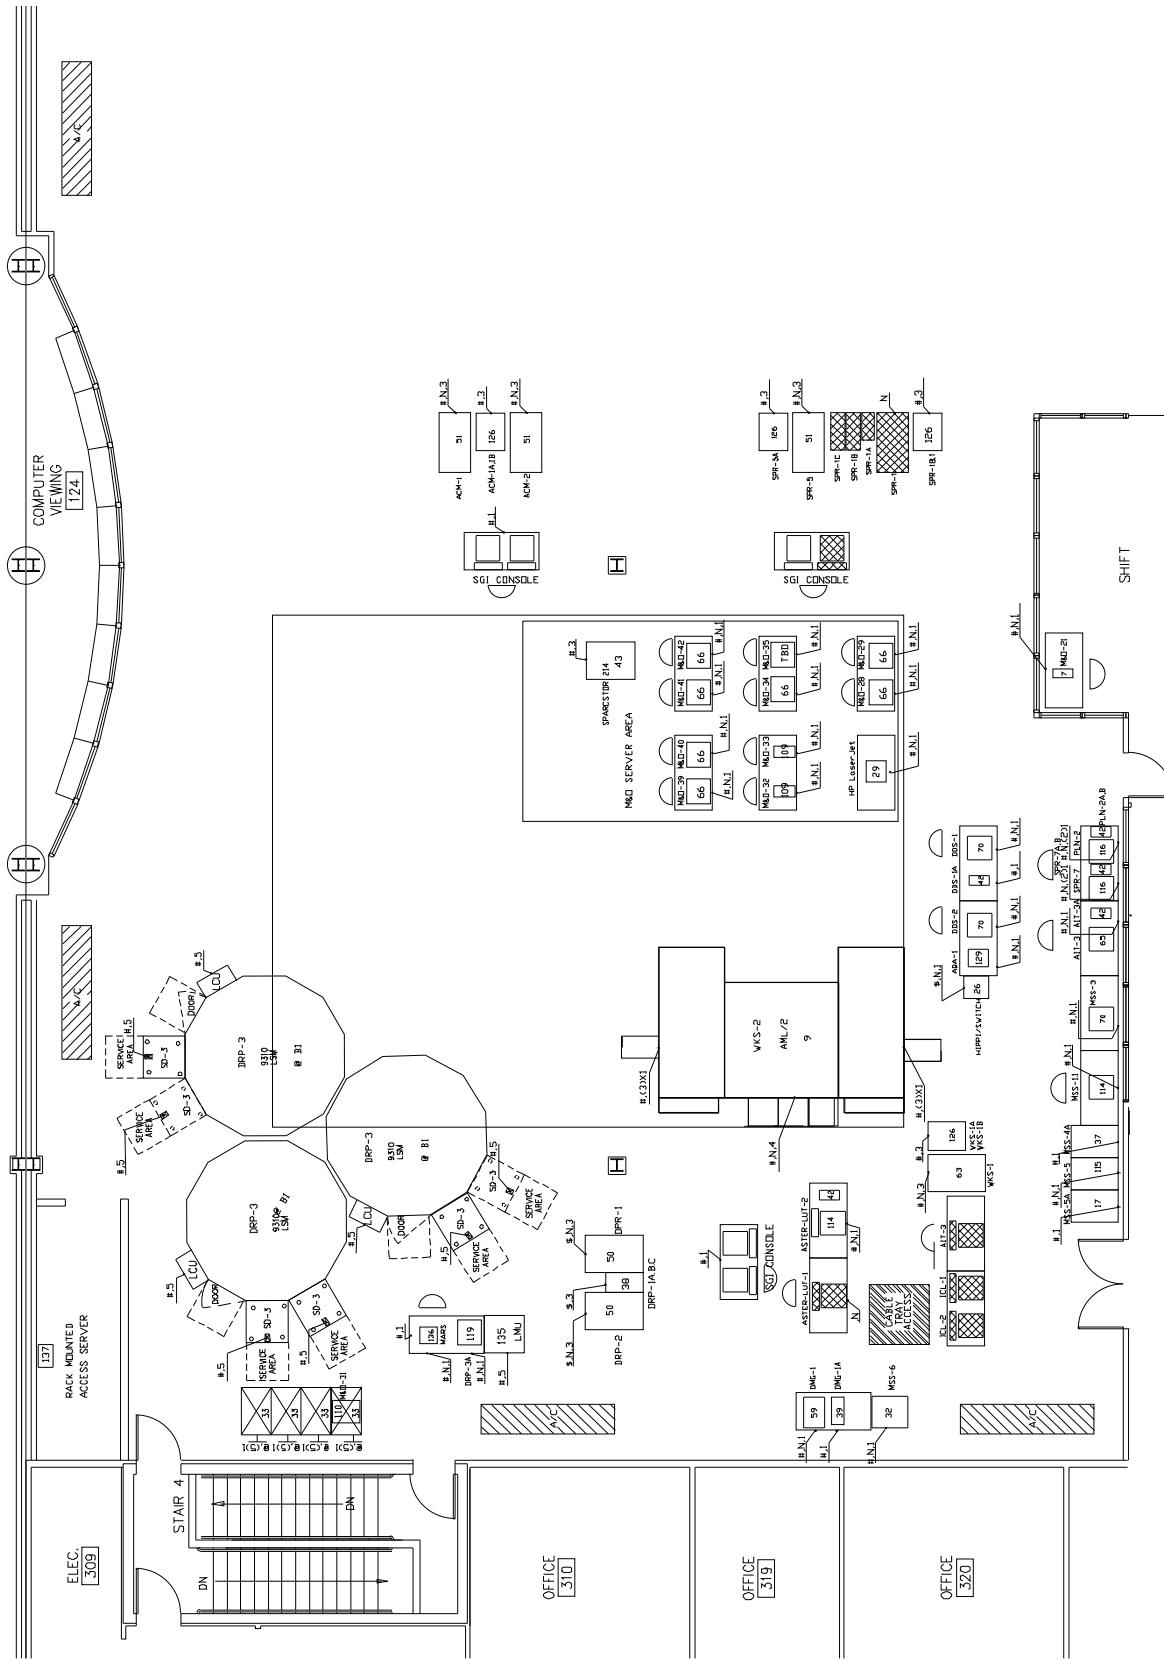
EDC Release B First Procurement Floor Plan -- Room 1500
